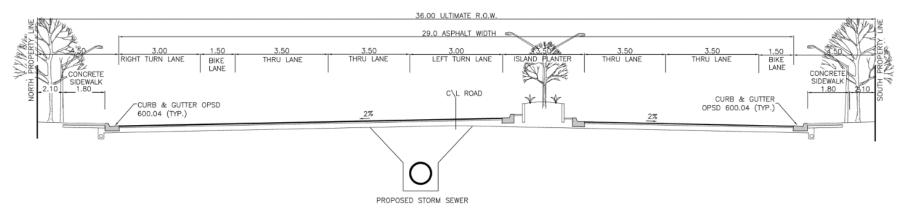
SUNNINGDALE ROAD EAST TYPICAL CROSS SECTION
